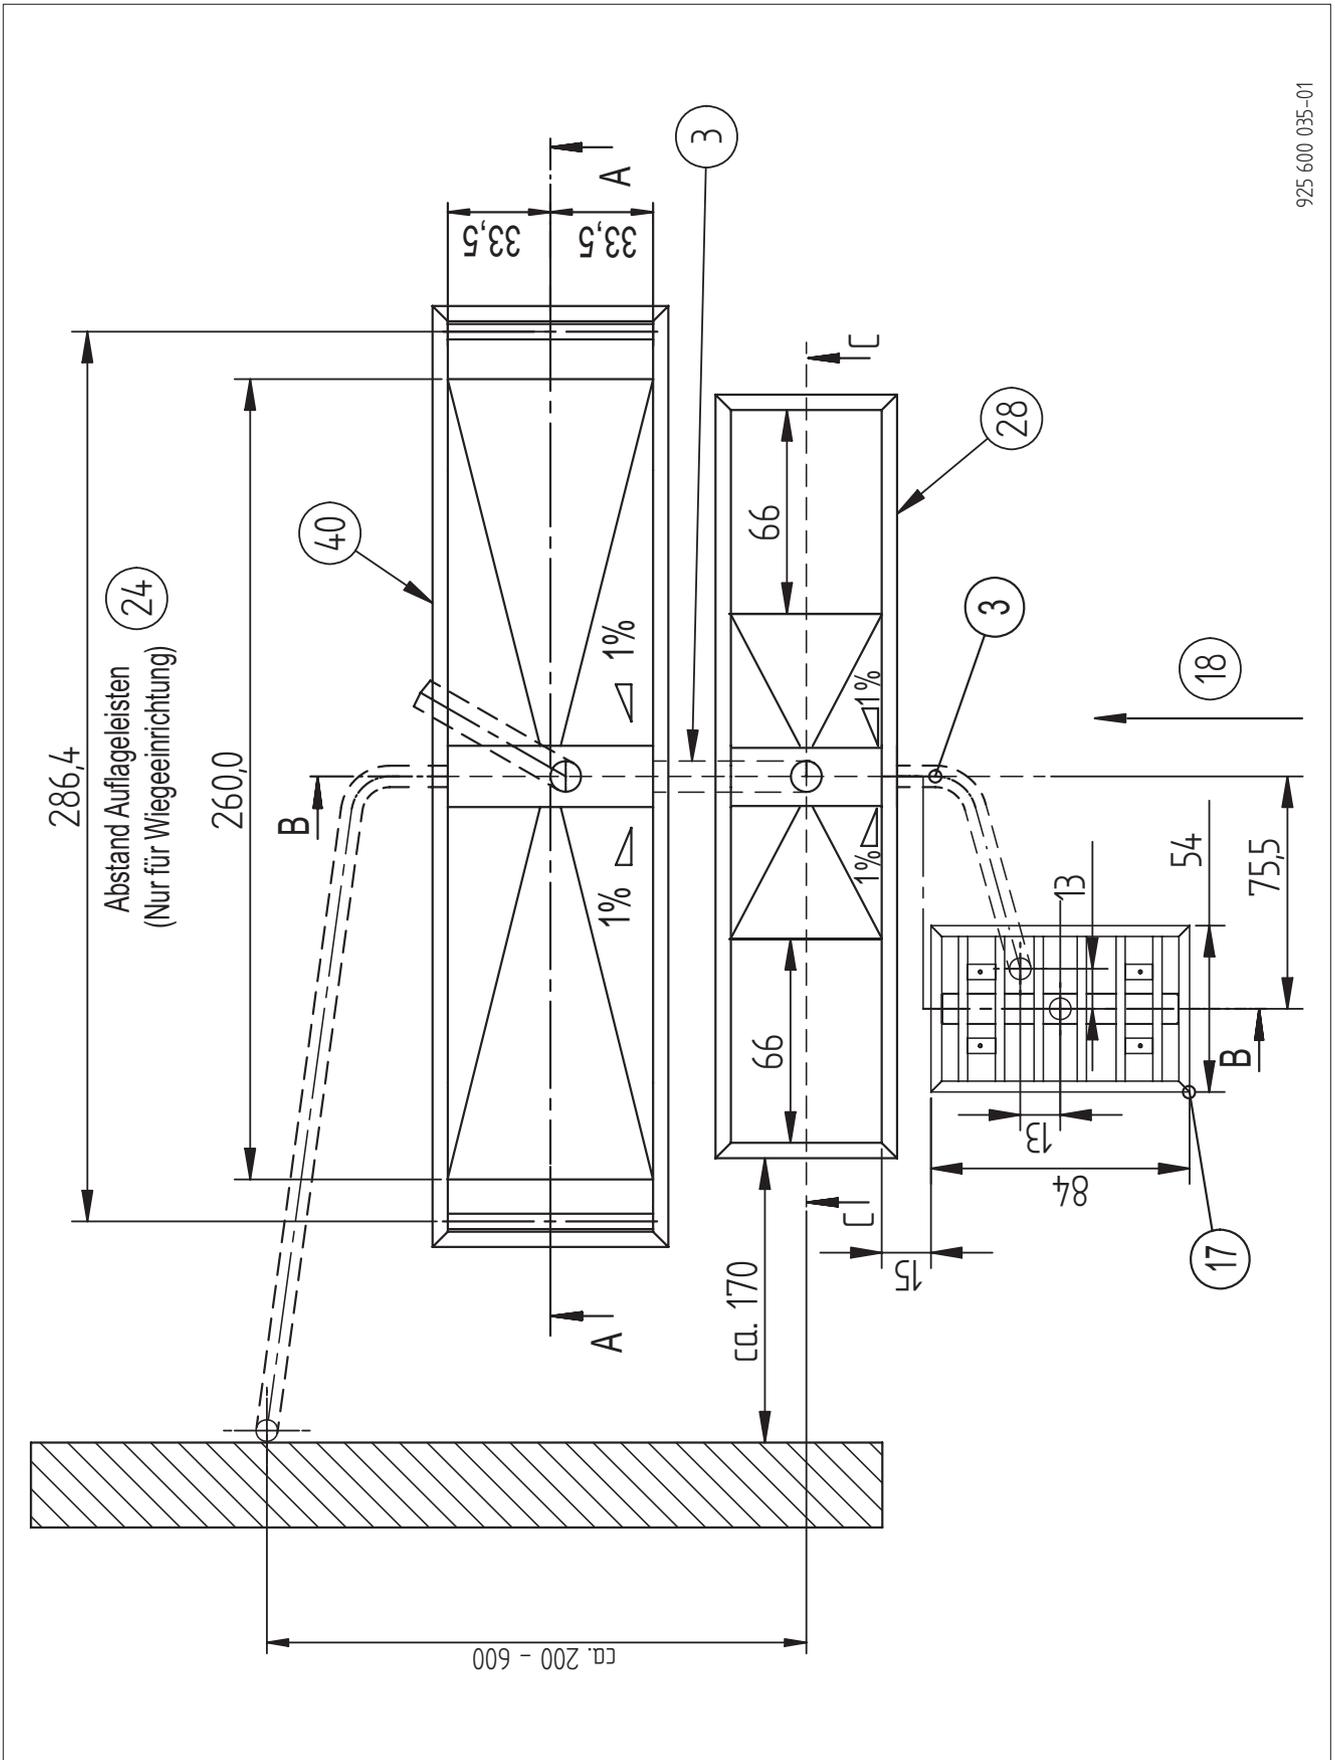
Plan of Pit BD 660 with PC, suspension tester and side slip tester - Ground plan
